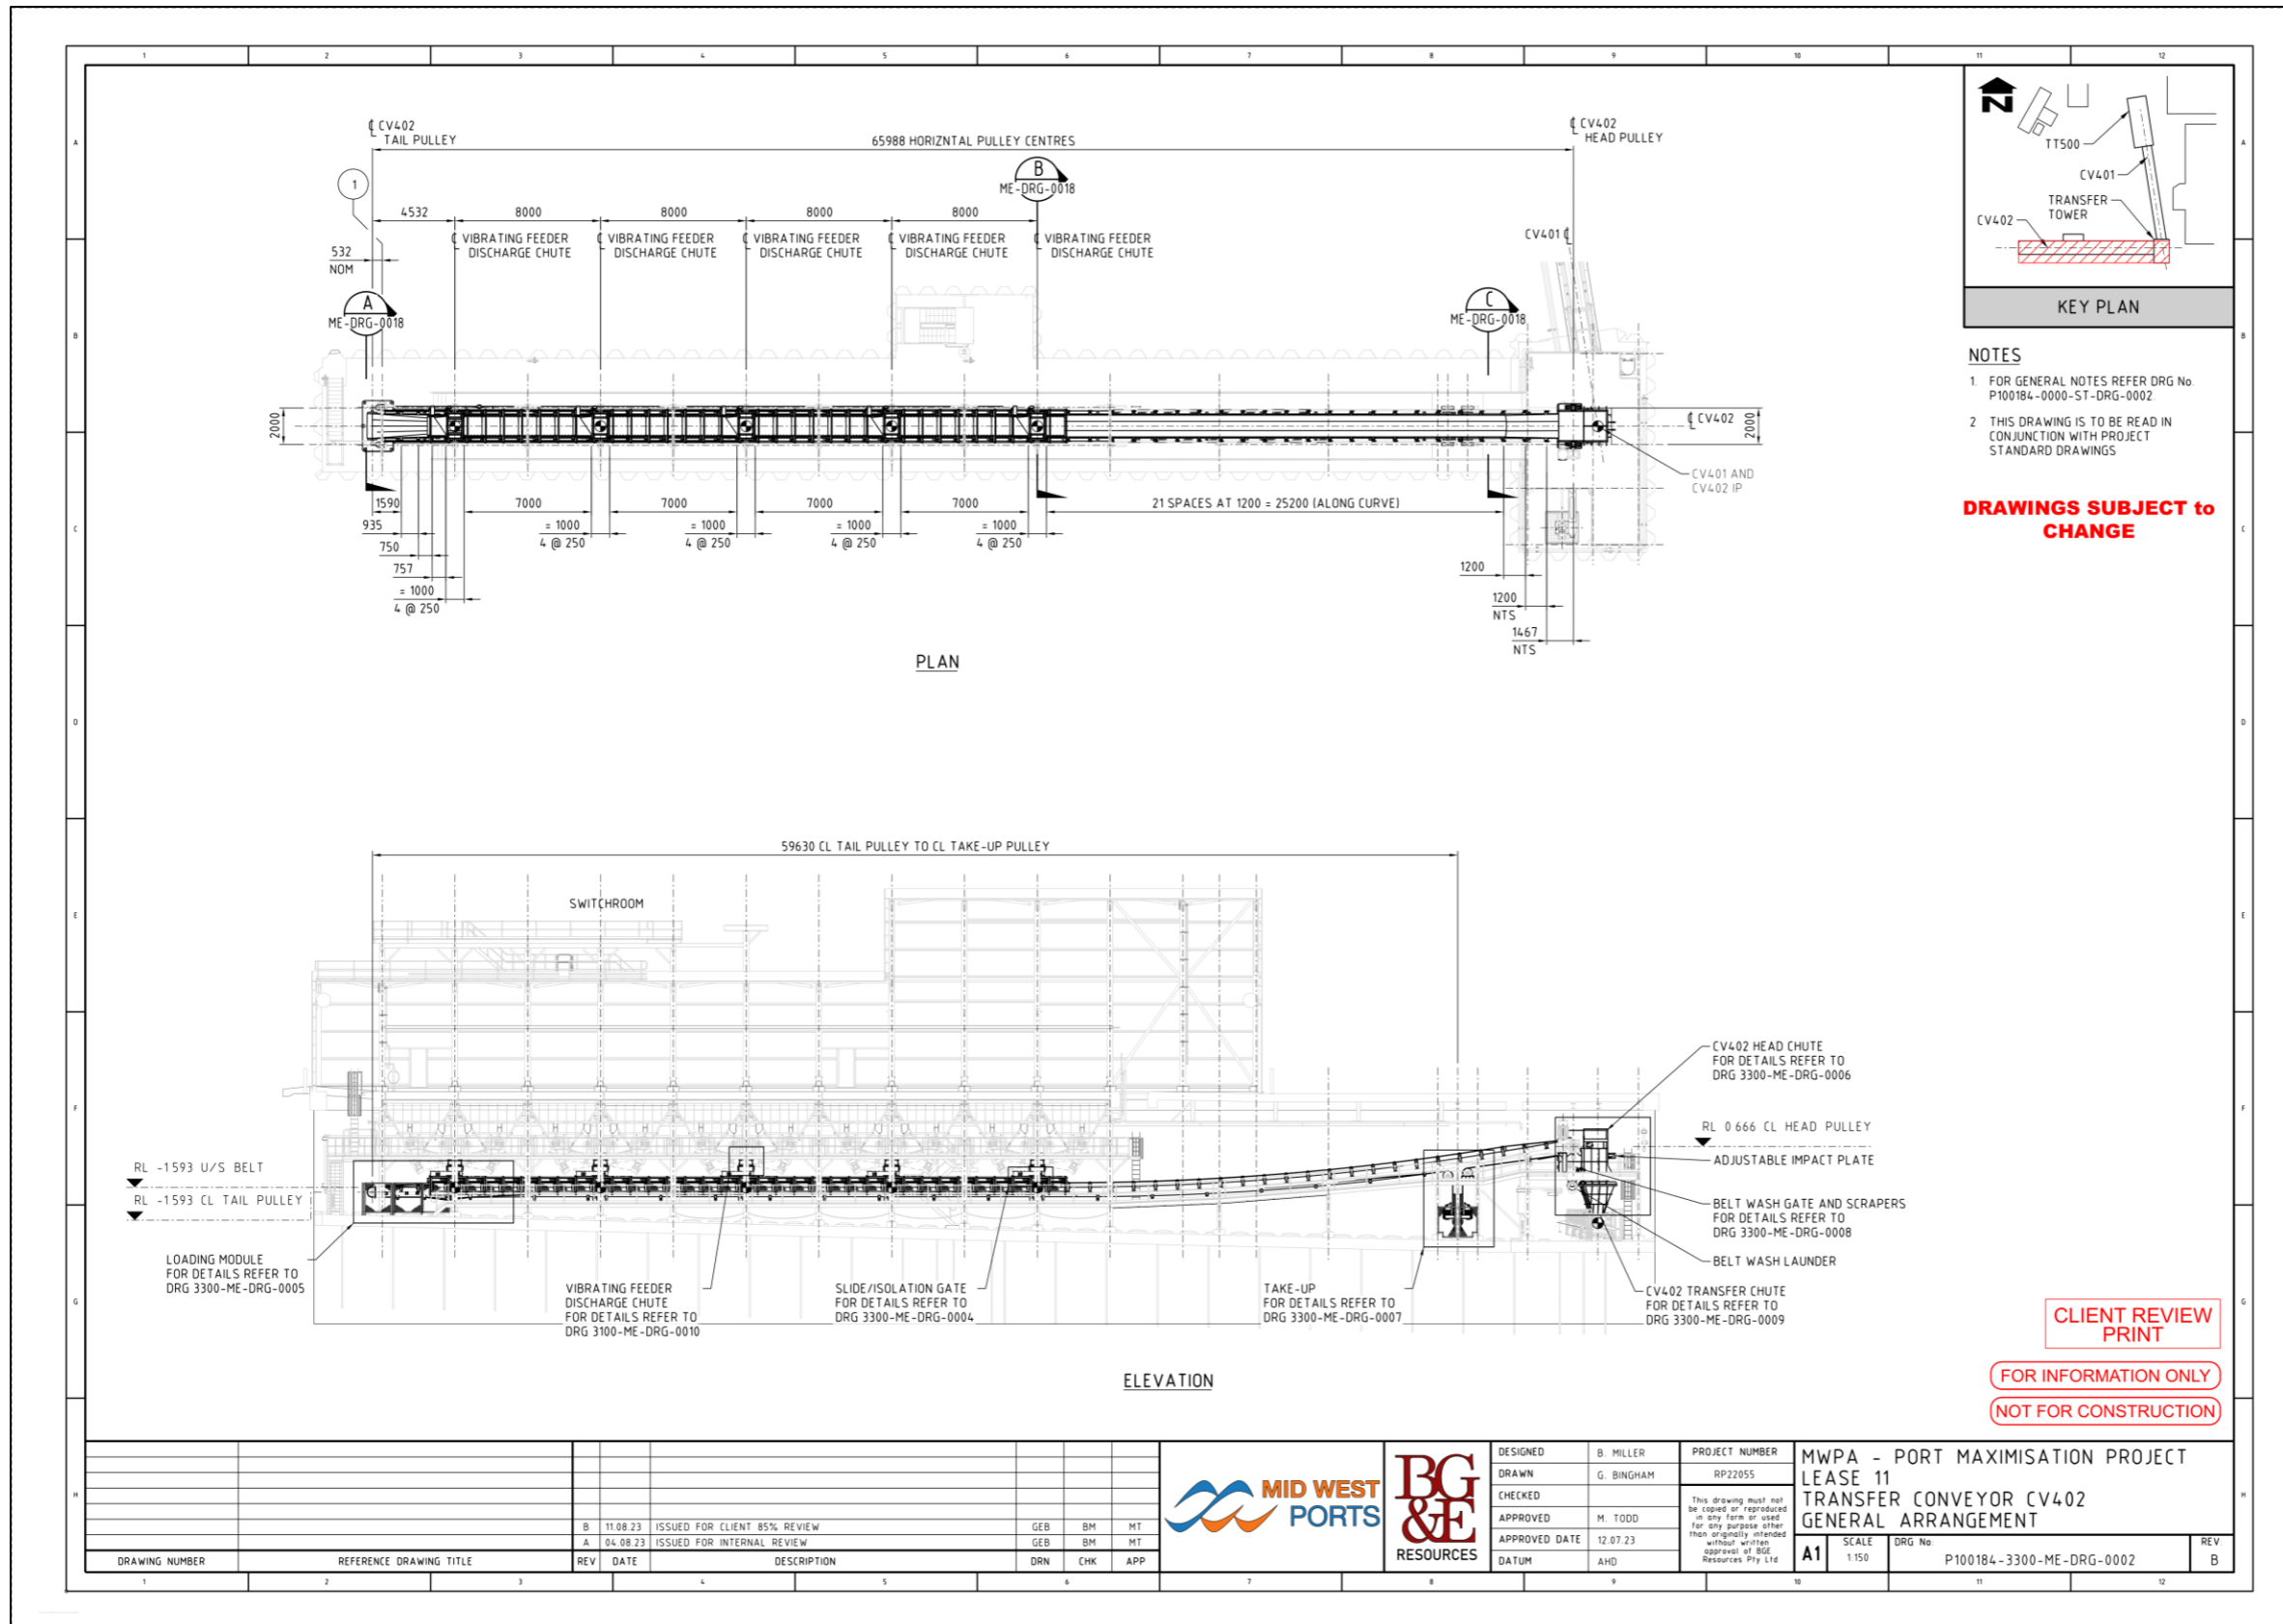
Construction drawing for conveyor CV402 – general arrangement
